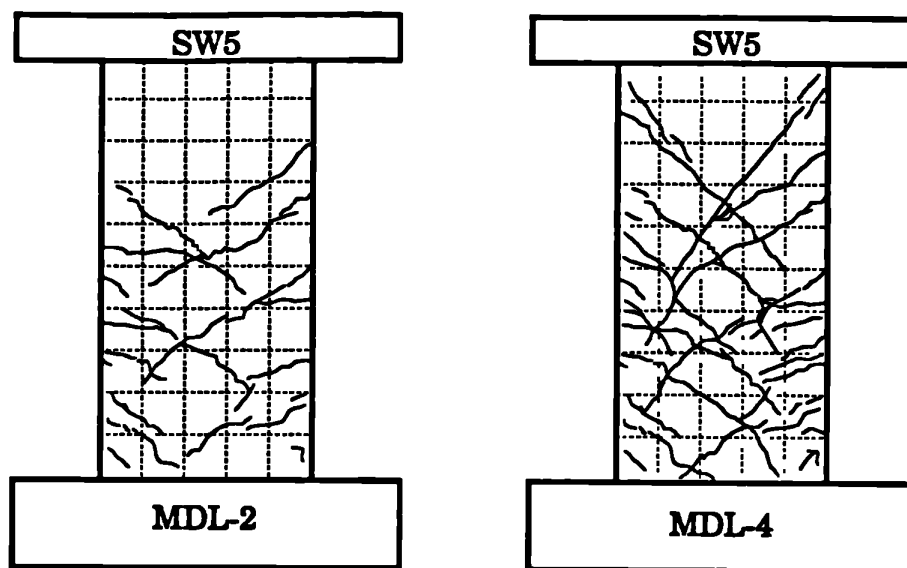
PilaSW5: DS1a - cracks at MDL-2 (peak after initial cracking) and MDL-4 (wall fully cracked)
